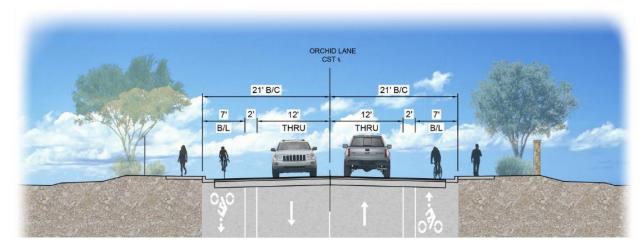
Orchid Lane Typical Section - Segment H2 Separated Bike Lanes/No Parking
